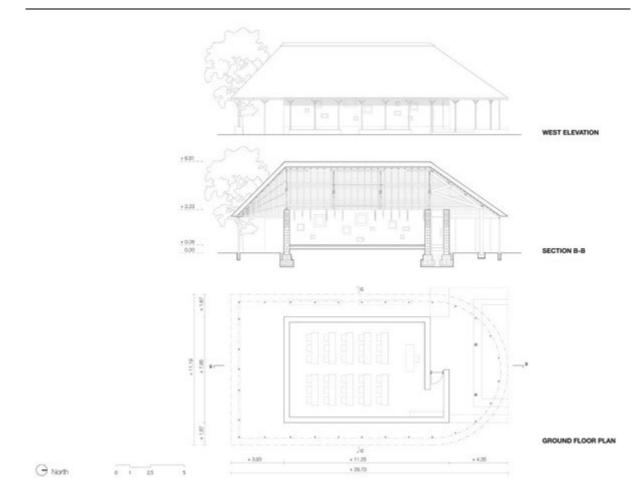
West elevation, longitudinal section, and ground floor plan of the third classroom
